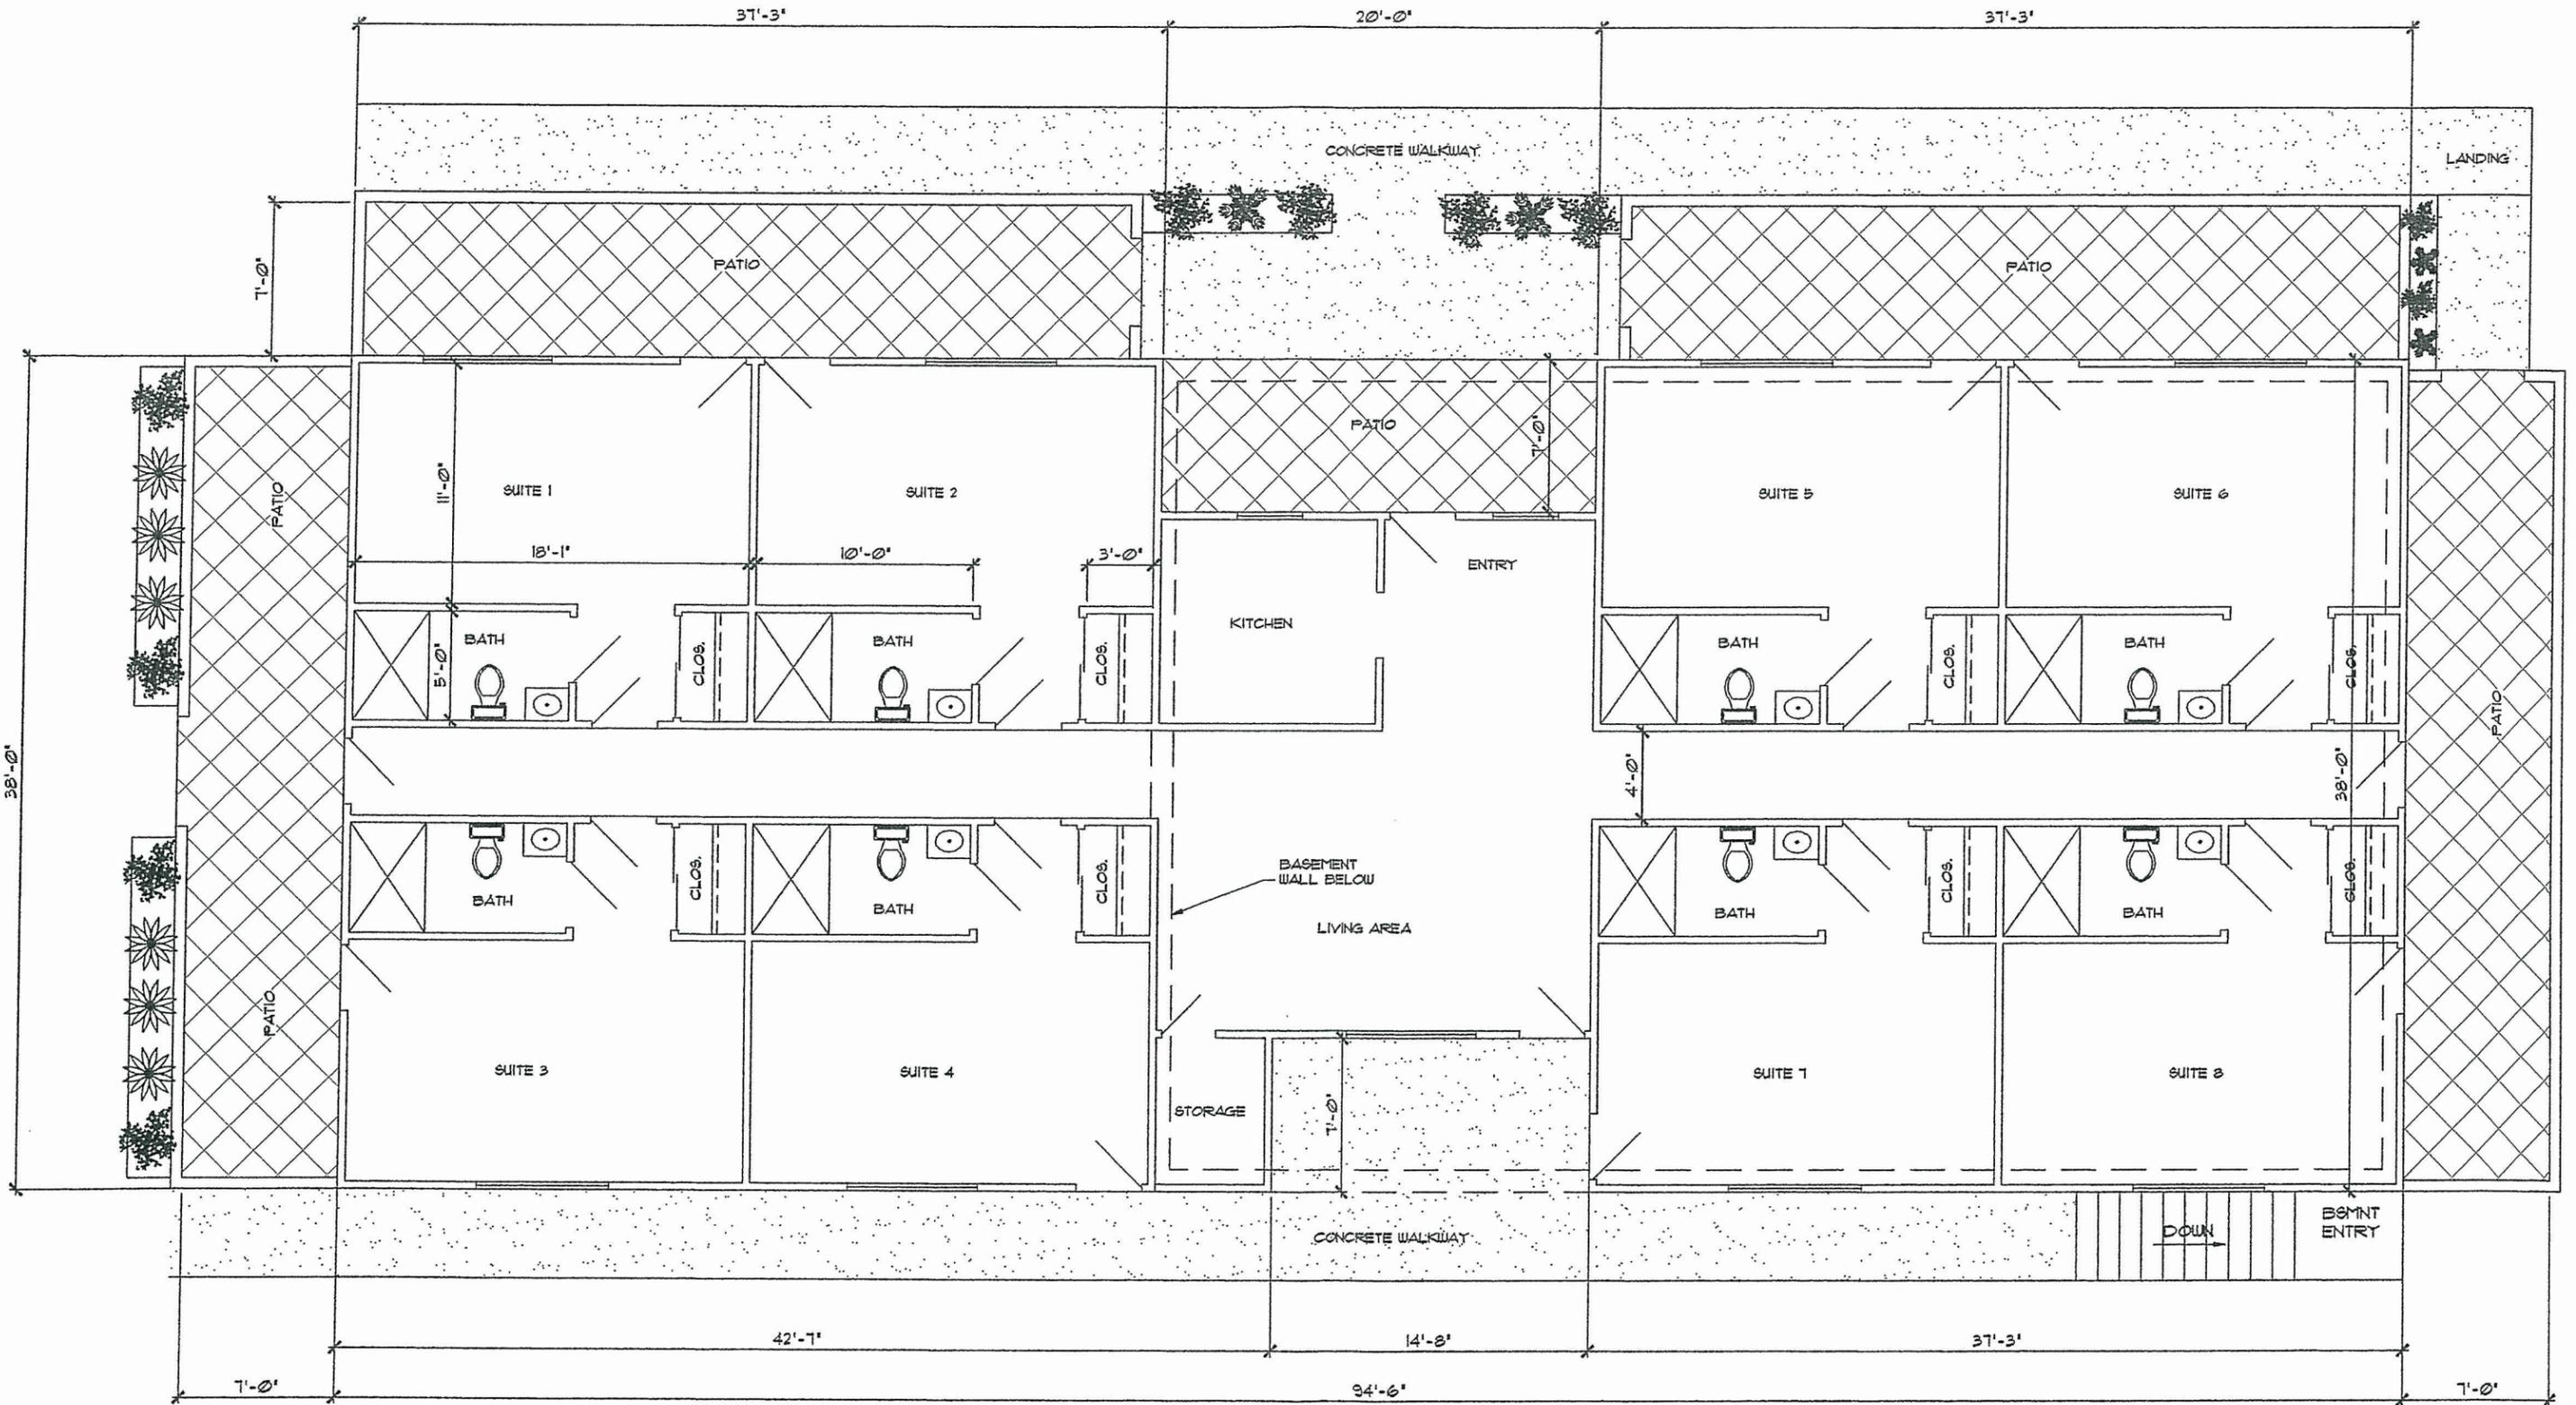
PROPOSED FLOOR PLAN FOR LAMBERT COTTAGE
